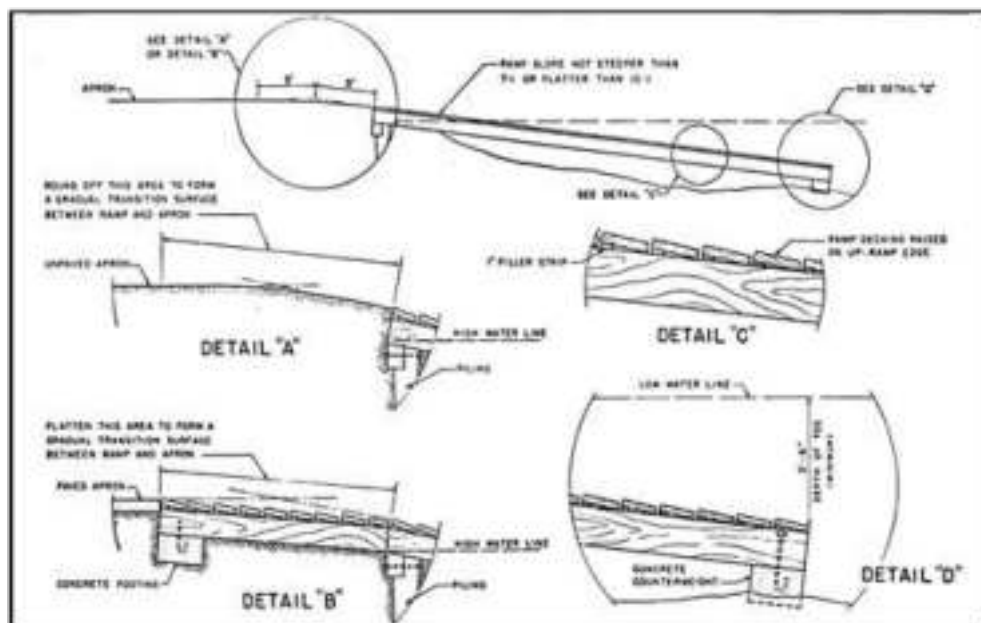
RAMP WITH SUBMERGED RAMP TOE
